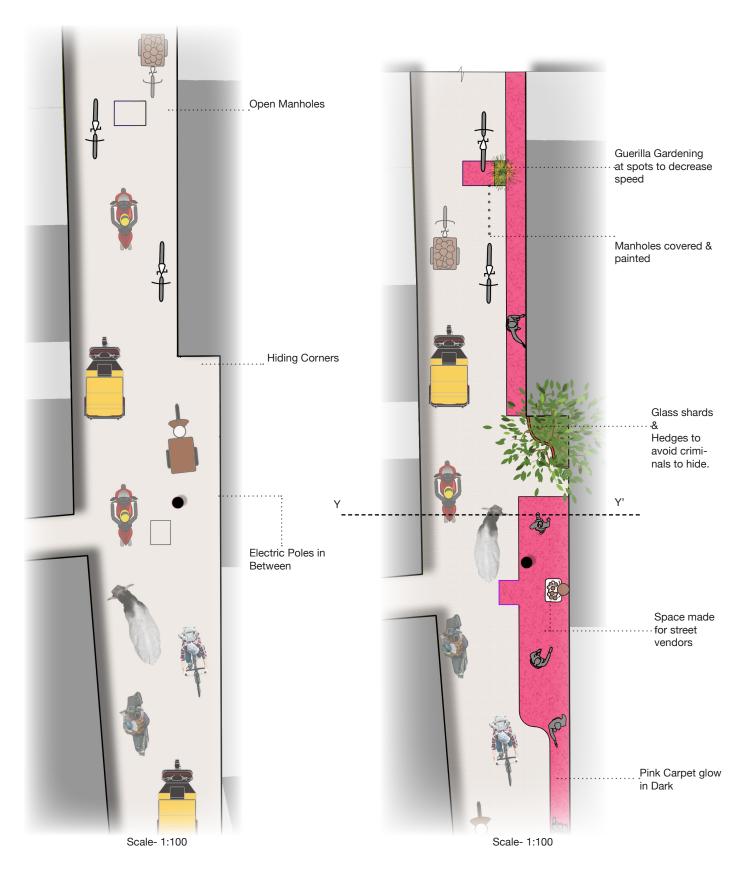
Existing Plan of Mixed use street Source: made by author
